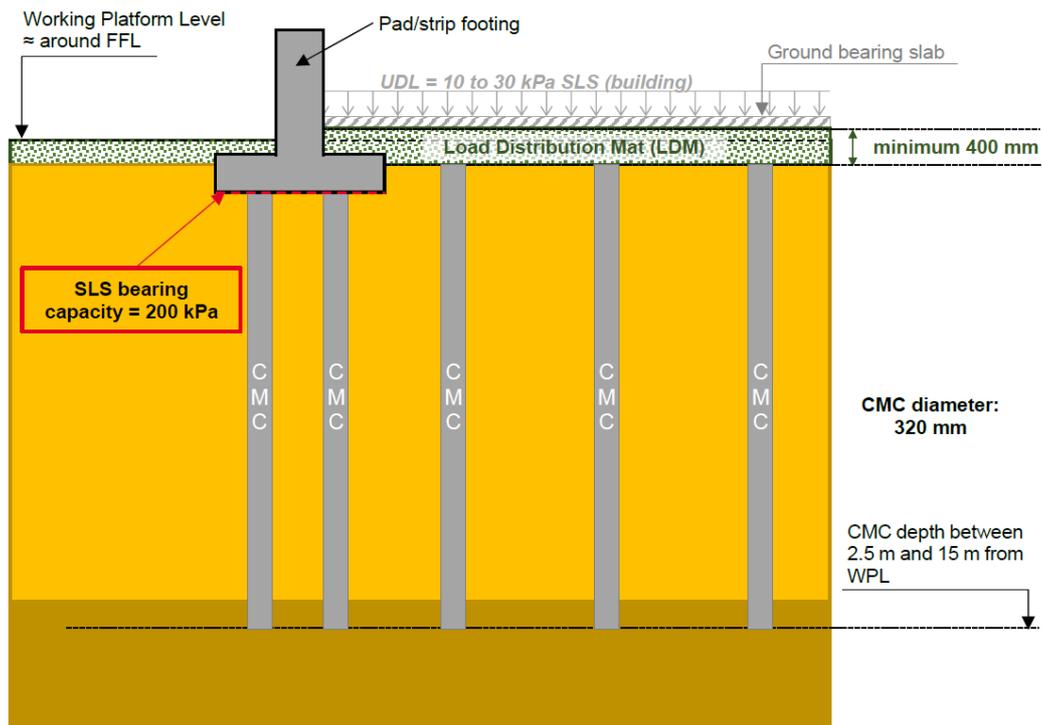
Typical cross-section of foundation and ground floor slab over CMCs
